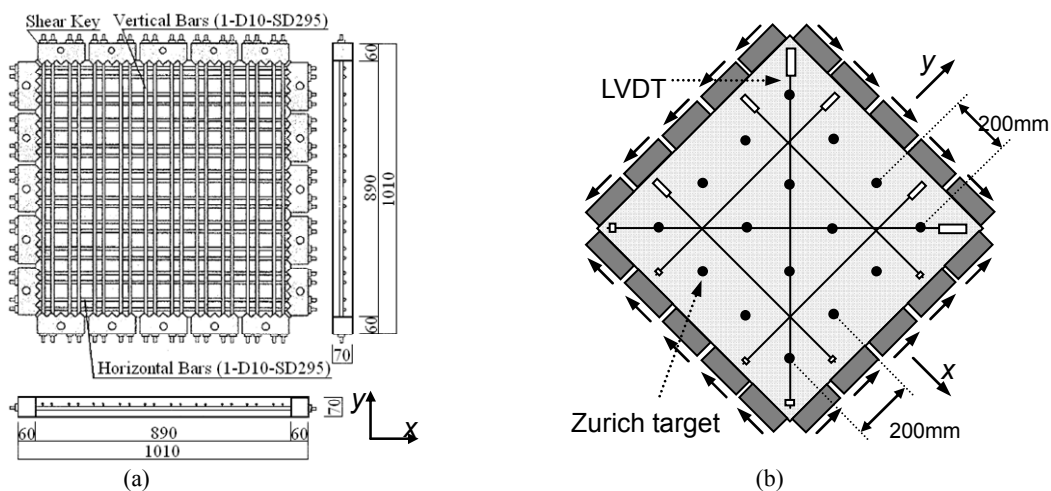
Details of test panel: (a) Example of reinforcement details of Panel PK3 (Xoxa 2003) and (b) Typical instrumentation of the test panels.
